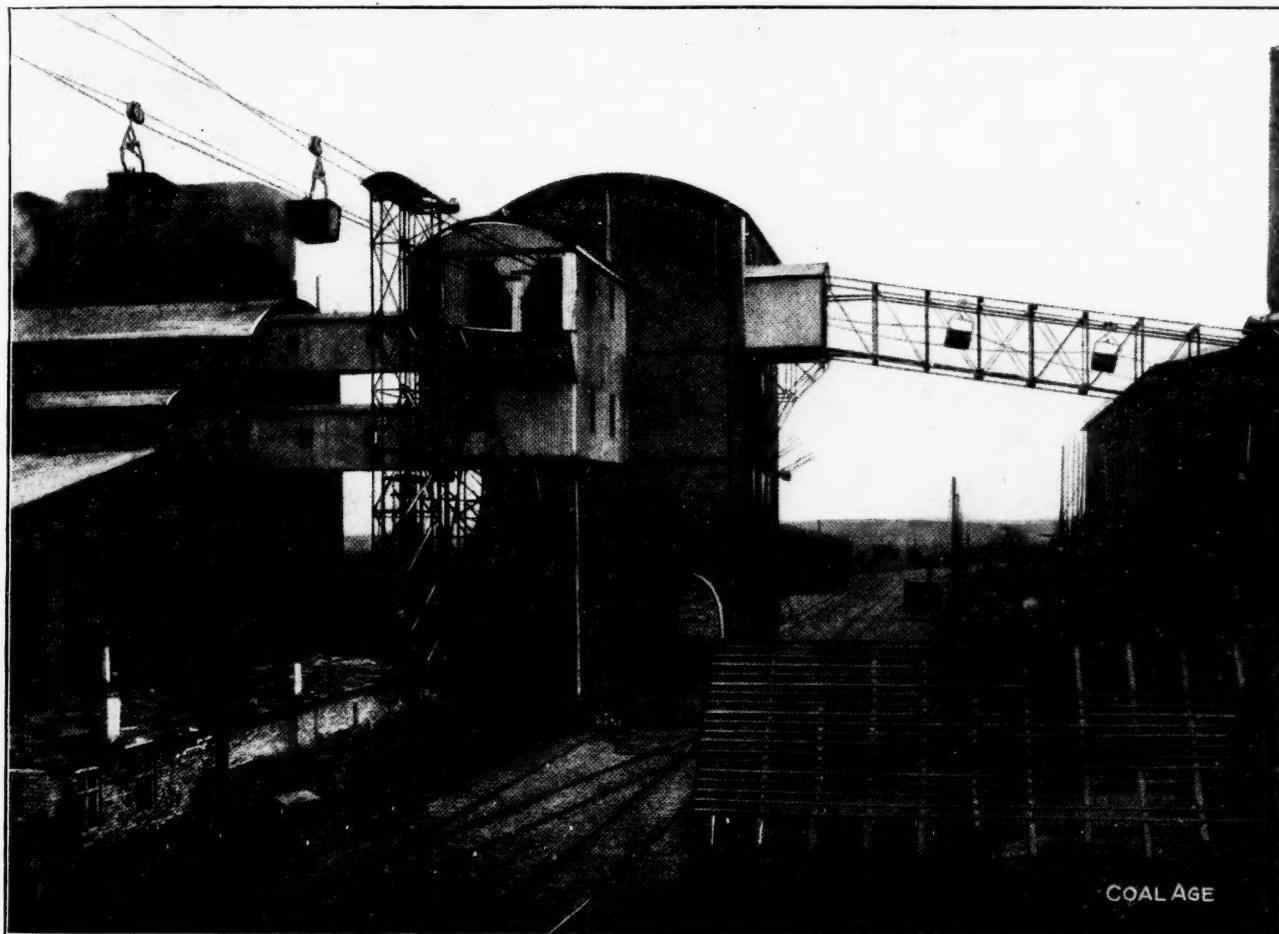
WIRE ROPEWAYS. NOTE THE PROTECTION BRIDGE ERECTED OVER THE ROAD CROSSING TO INSURE PUBLIC SAFETY
